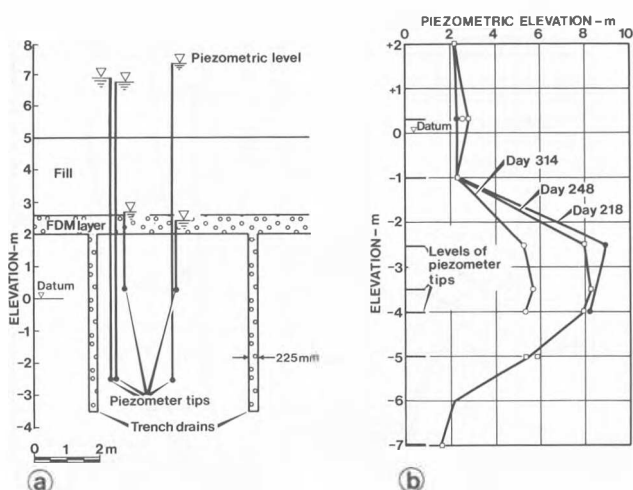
Sandwich By-Pass. a) Piezometer readings at Trench Drains, b) Results of Sand Drain Trial.
